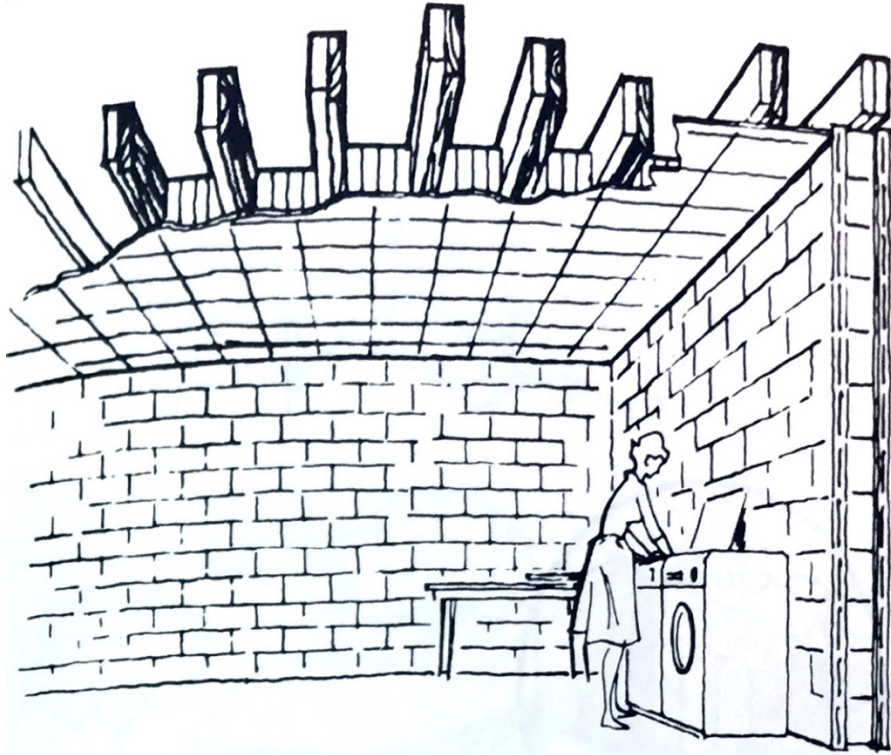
A woman does laundry beneath the reinforced ceiling, 1966.⁶⁵
